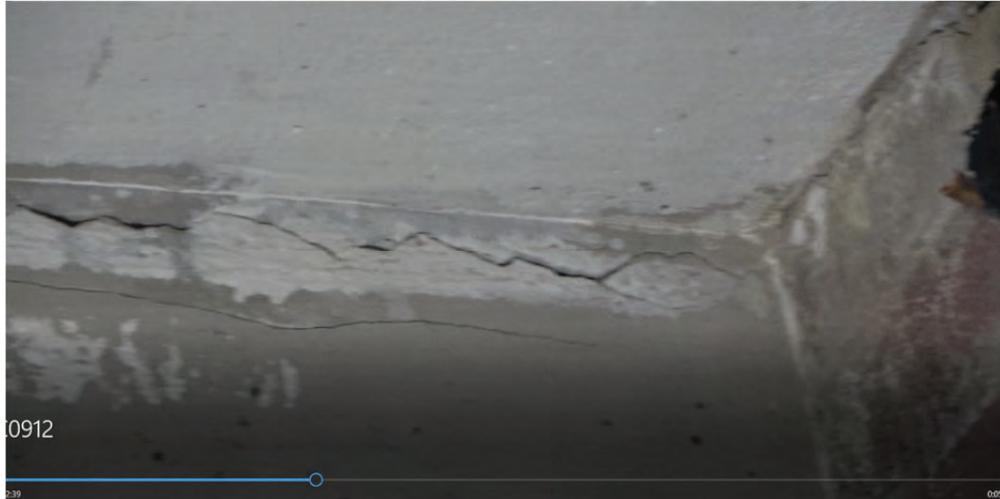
Cracks in top of retaining wall at join to suspended slab and brick wall at 3:R Southern side.
